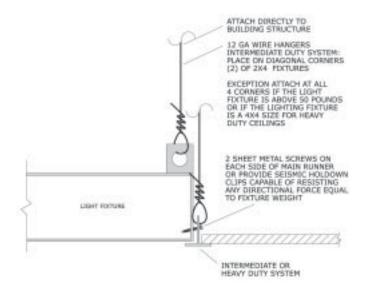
Typical ways to attach light fixturesin suspended T-bar ceiling.
